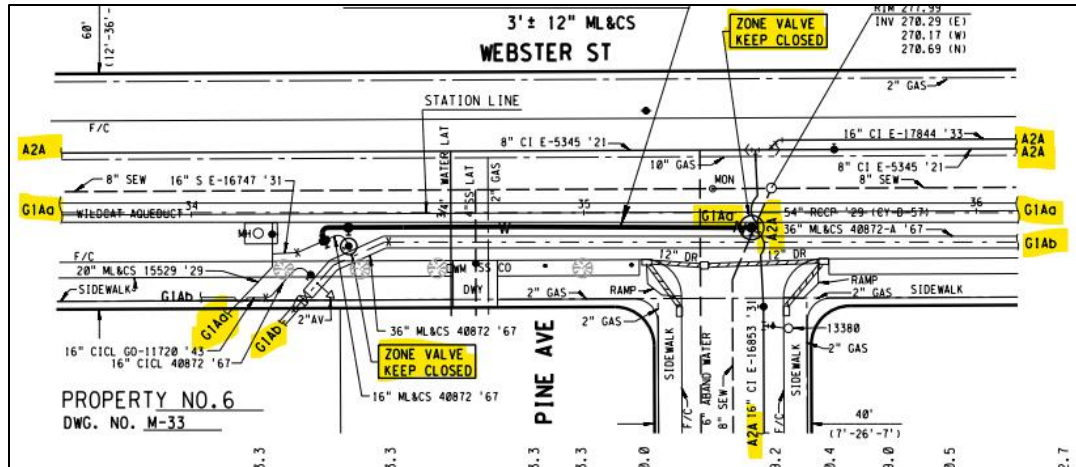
Pressure Zone Labels on Plan Sheets
